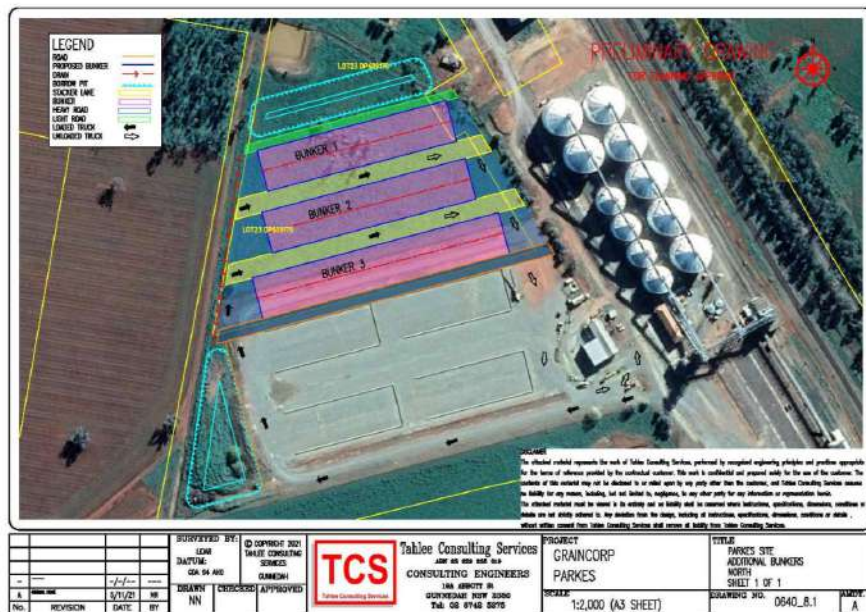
The layout plan for the additional bunkers in the proposed northern development area at the Graincorp Parkes site (Tahlee Consulting Services dated 5/11/21).
